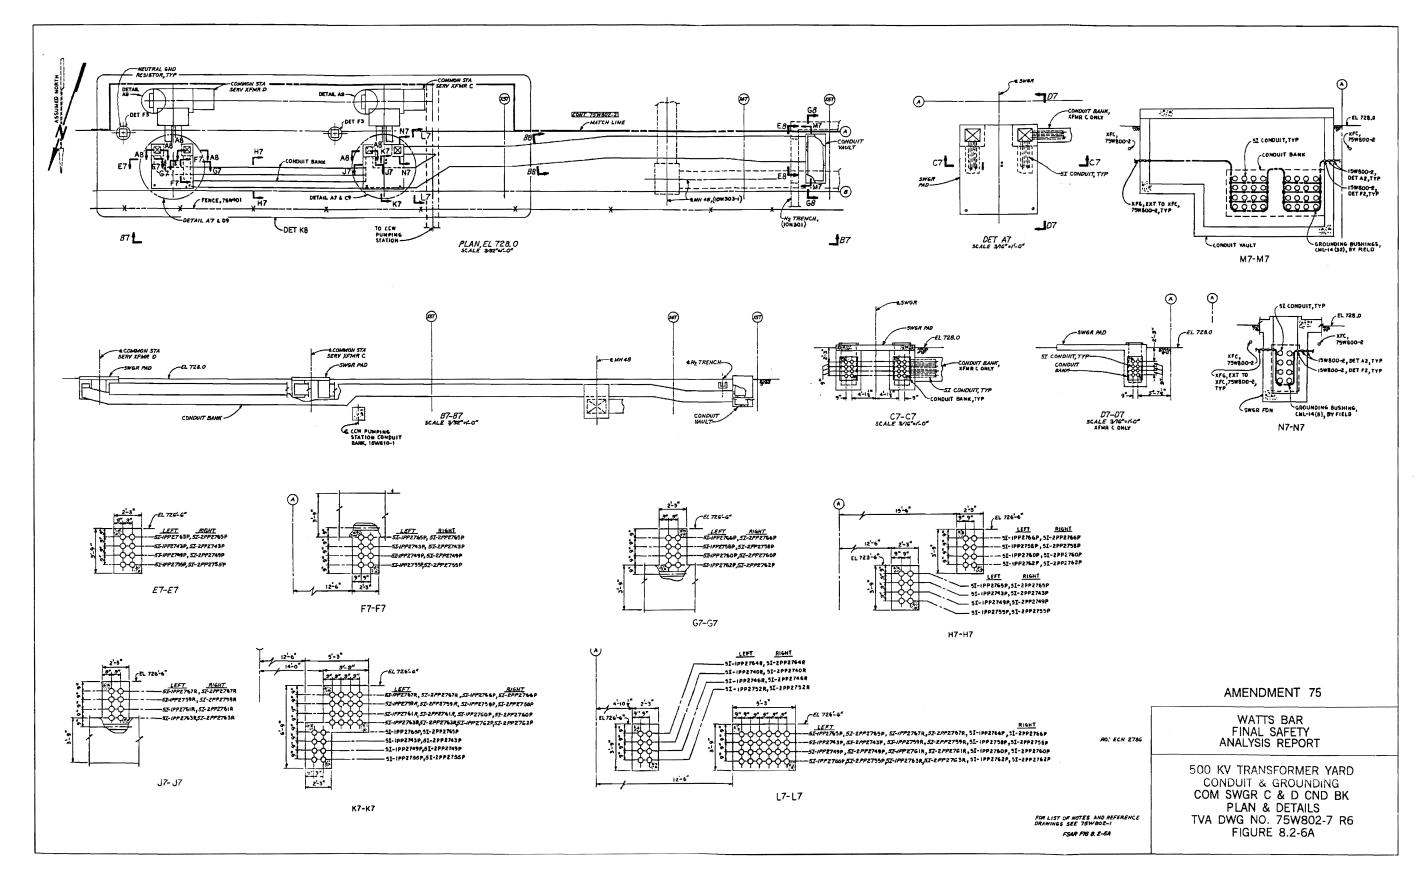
500kV Transformer Yard Conduit and Grounding Com SWGR C&D CND BK Plan and Details
